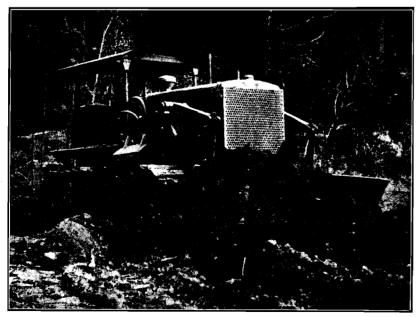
Showing trail builder at work on the Keiwa Road,
